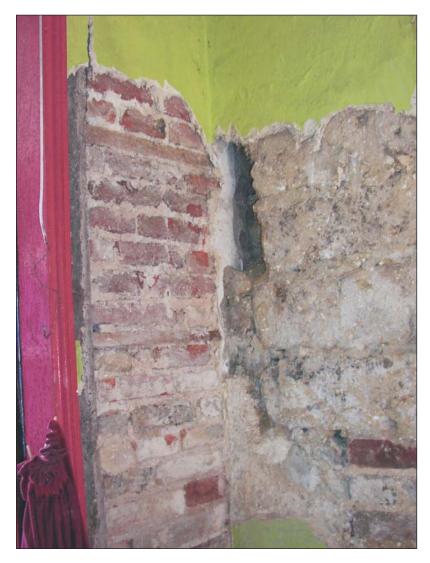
Junction of the brick wall of the south service room and the south wall showing the apparent anomaly of the plastered surface extending beyond the face of the outside wall
